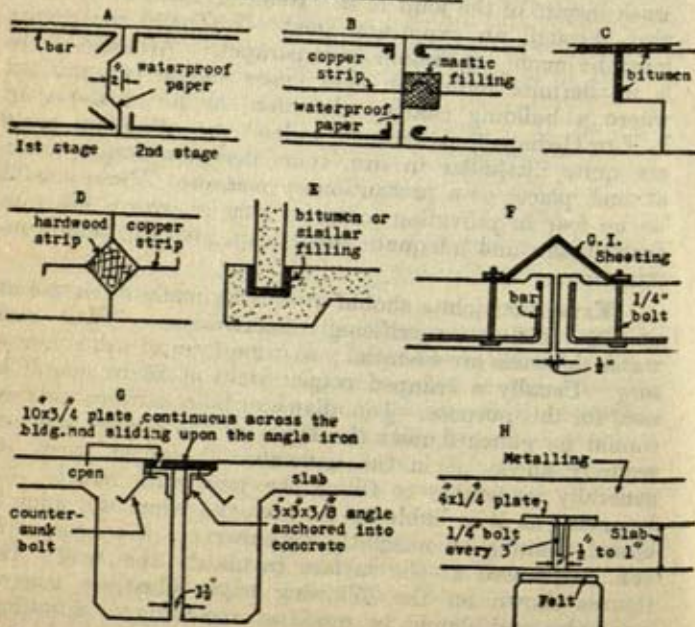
Fig. E :* Base of wall of cylindrical tank, where wall and floor are not monolithic.
